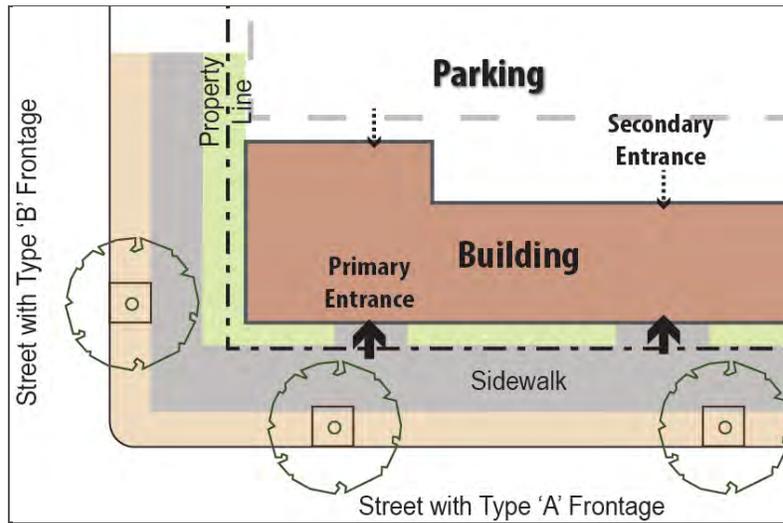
Illustration showing required building orientation and location of primary entrances
